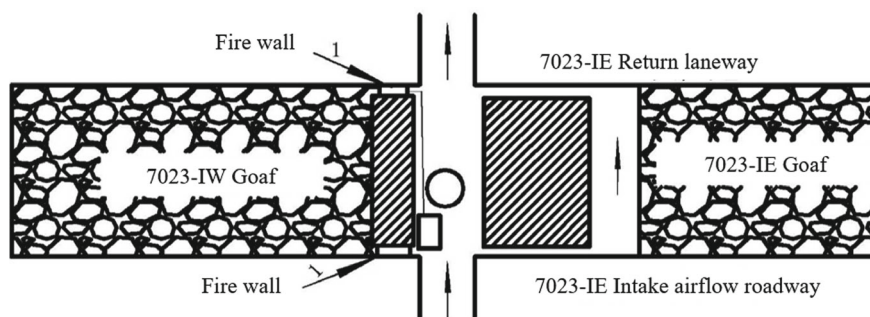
Example of uniform pressure fire prevention techniques for mined-out area fires
